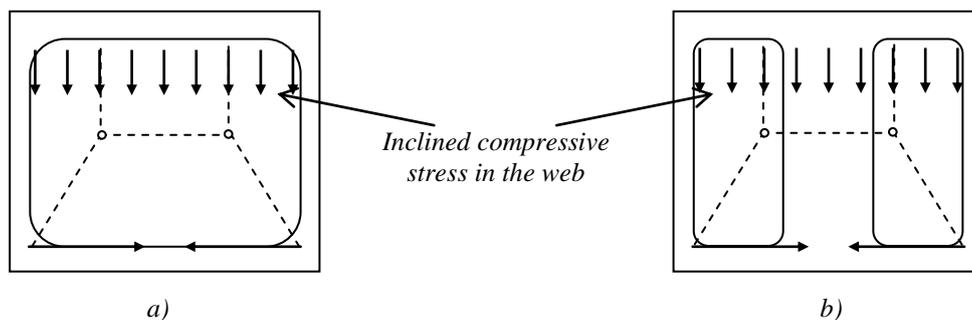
Different shear reinforcement configurations, a) shear reinforcement enclosing the whole section and resisting the transverse tensile component, b) shear reinforcement does not enclose the whole section and the concrete must consequently resist the transverse tensile component.
